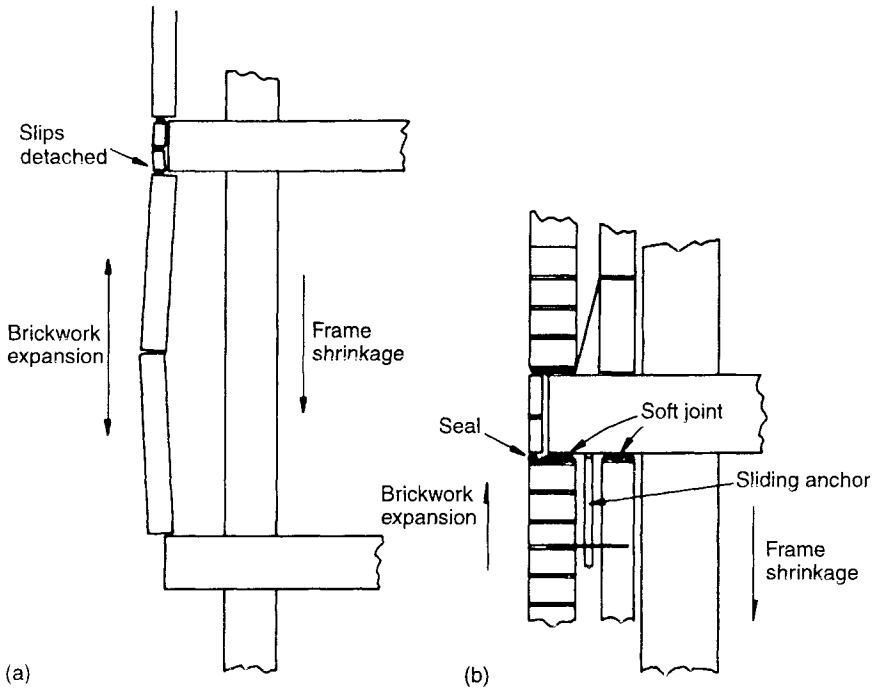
(a) Bowing of infill wall and detachment of brick slips as a result of frame shrinkage, (b) Detail of horizontal movement joint to avoid damage of the kind shown in (a).
